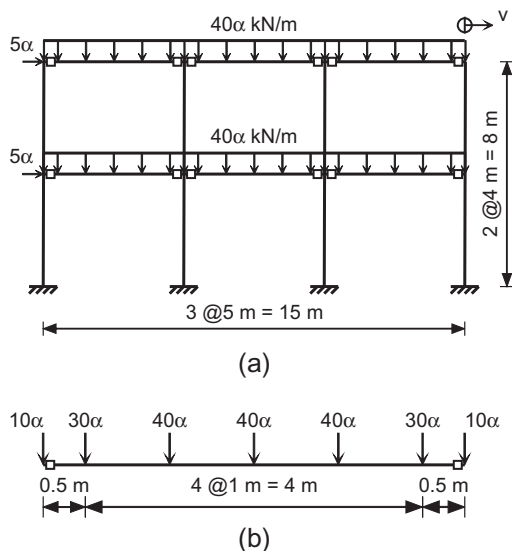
Example 3: multi bay portal frame: (a) structure and loading and (b) beam discretization.
